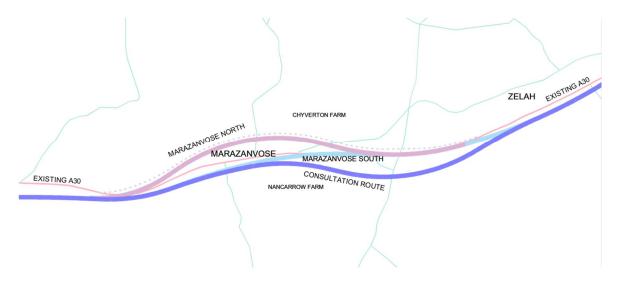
Alternatives between Town and Country Motors and Zelah bypass
